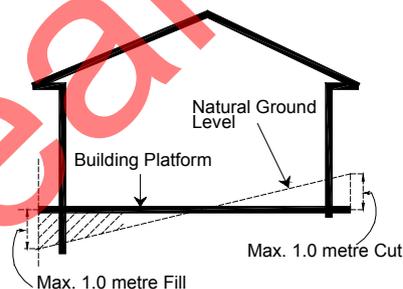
Cross section of cut and fill on a residential site.
